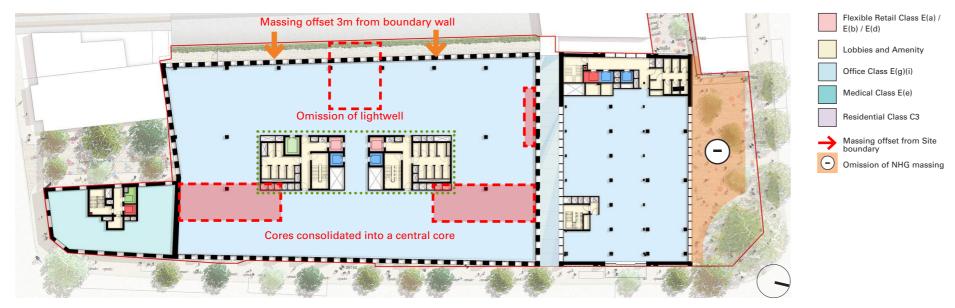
Design Responses to QRP 2 - Illustrative Typical Floor Plan
